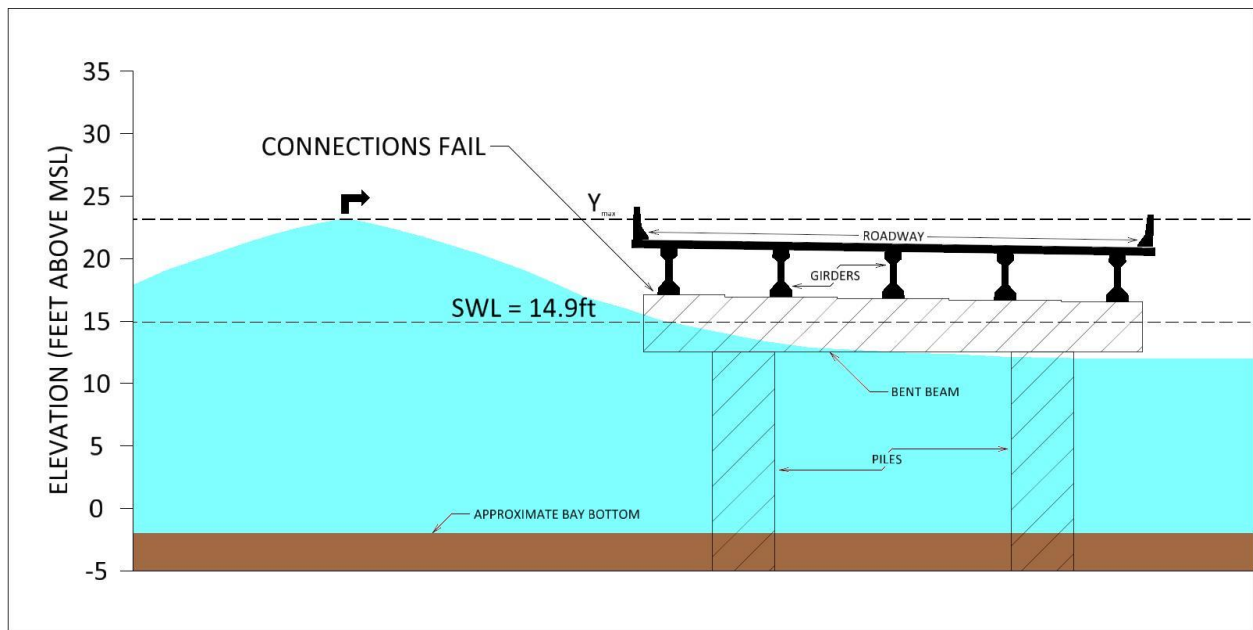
The findings of this study indicate that the bridge will be damaged by failure of the existing connections when the storm surge reaches about +14.9 feet.
